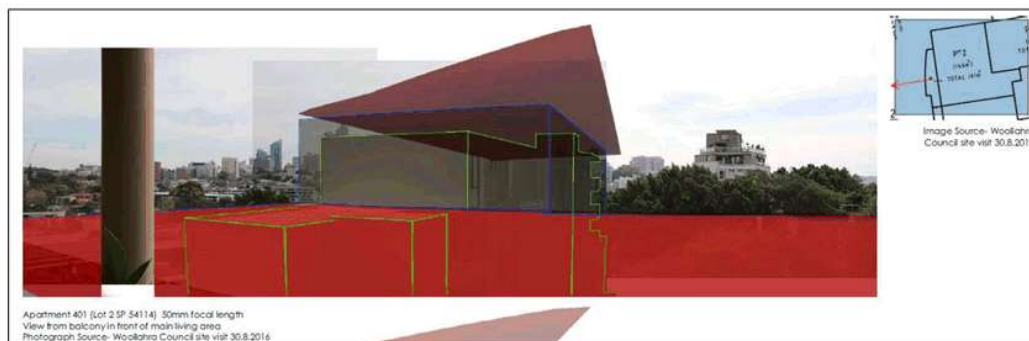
The extent of building height visible from Apartment 401, if the maximum building height currently permitted was implemented
